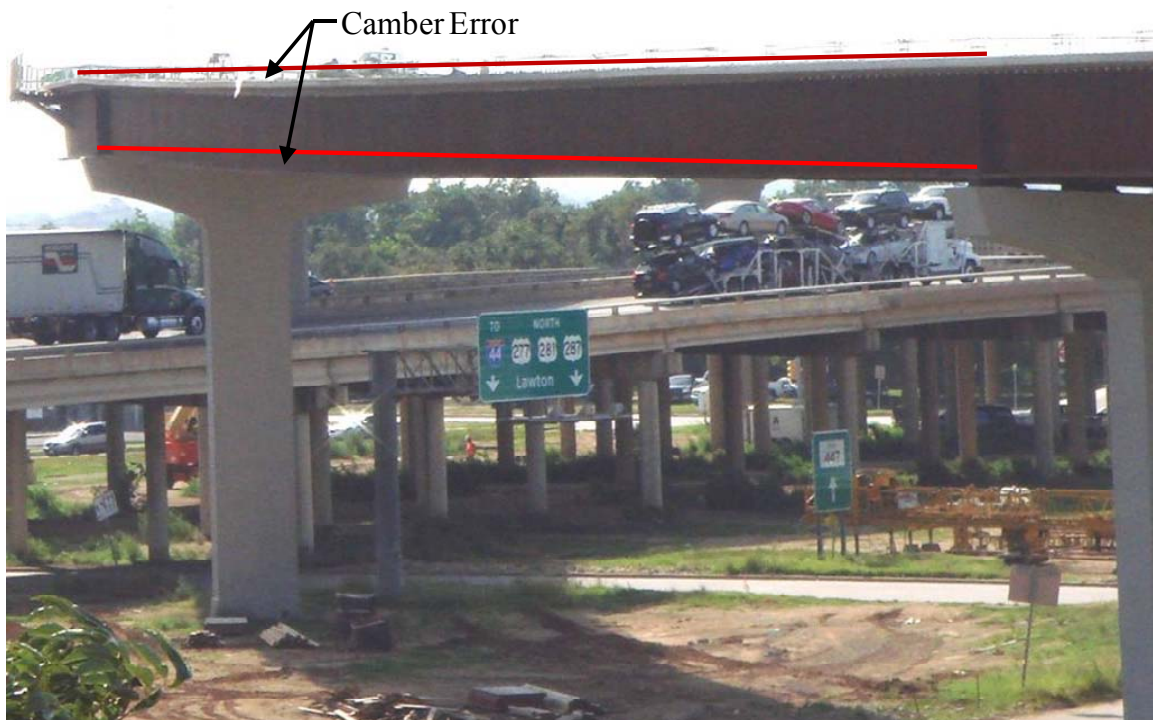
Curved I-girder Direct Connector Bridge in Austin, Texas during Construction
